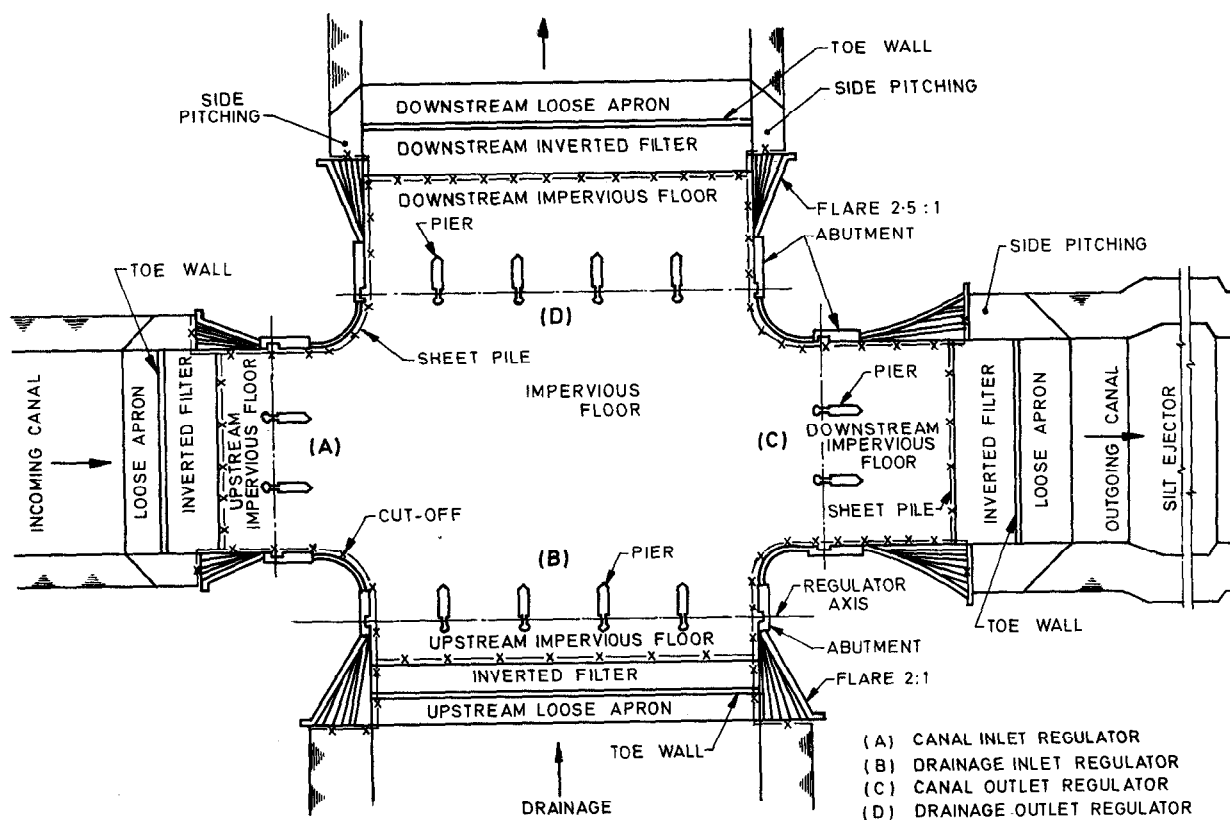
TYPICAL LAYOUT PLAN OF LEVEL CROSSING
